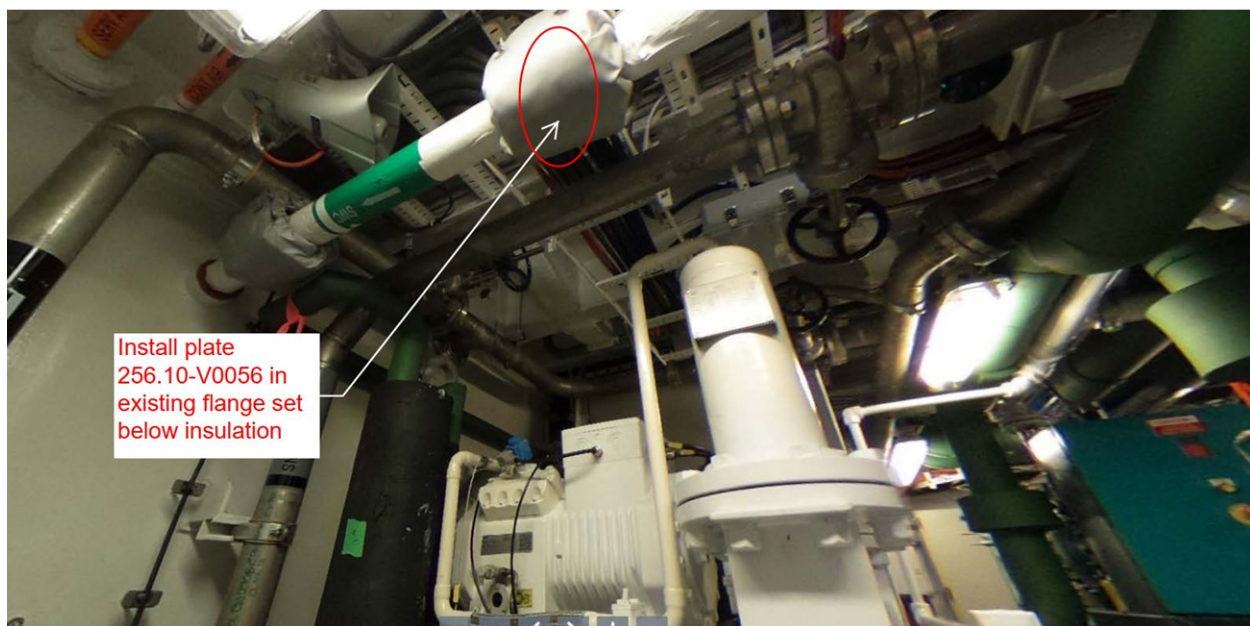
2A08 Machinery Space – Chiller Compartment – Looking into deck head / forward bulkhead from outboard side of refrigeration skid
